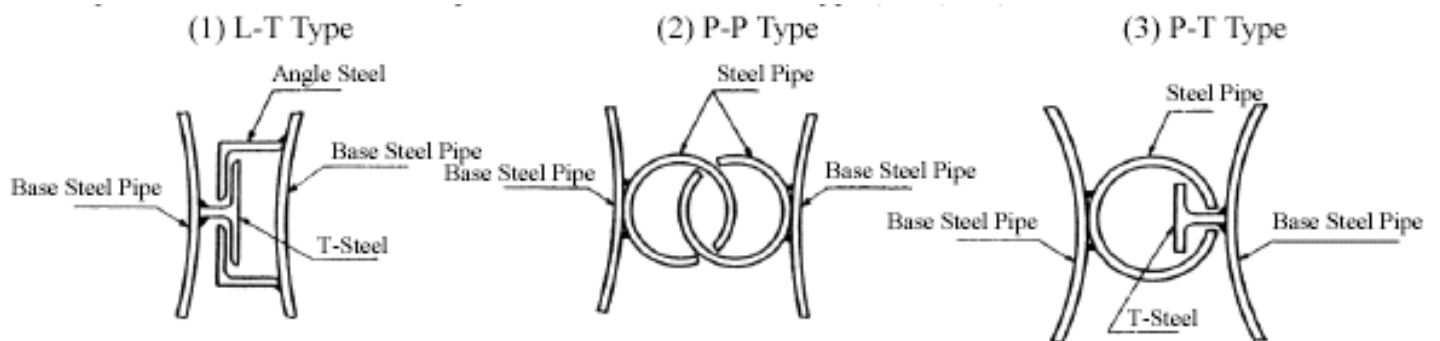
Typical cross-section configurations of steel pipe sheet pile (website of Atlantic Sheet Pile, Inc.)
